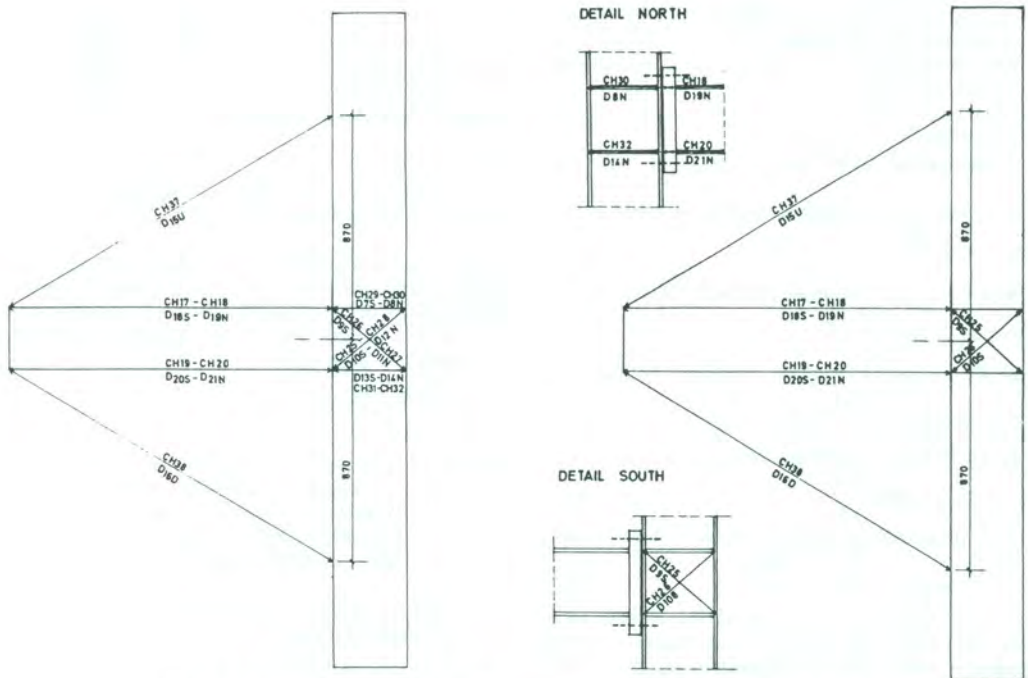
Detailed instrumentation set-up (a) welded specimen (b) bolted specimen
